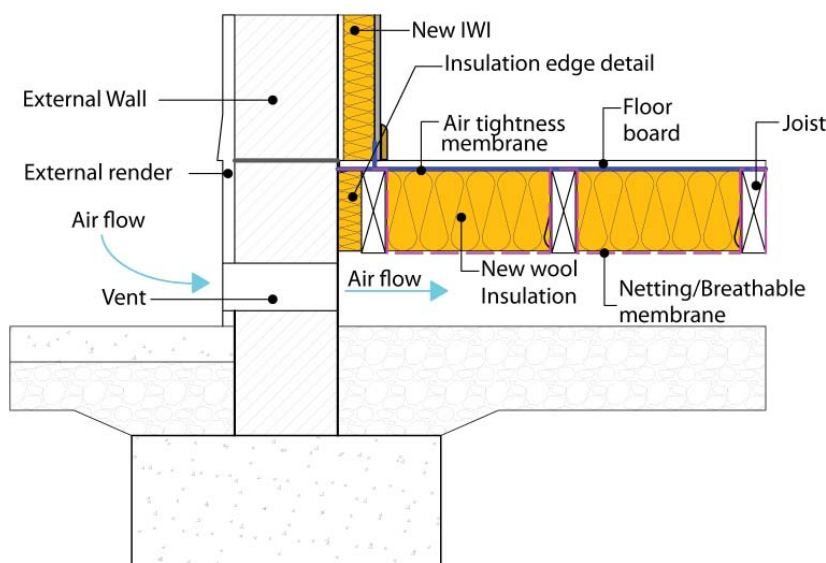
Insulation to suspended timber floor with mineral wool and IWI
